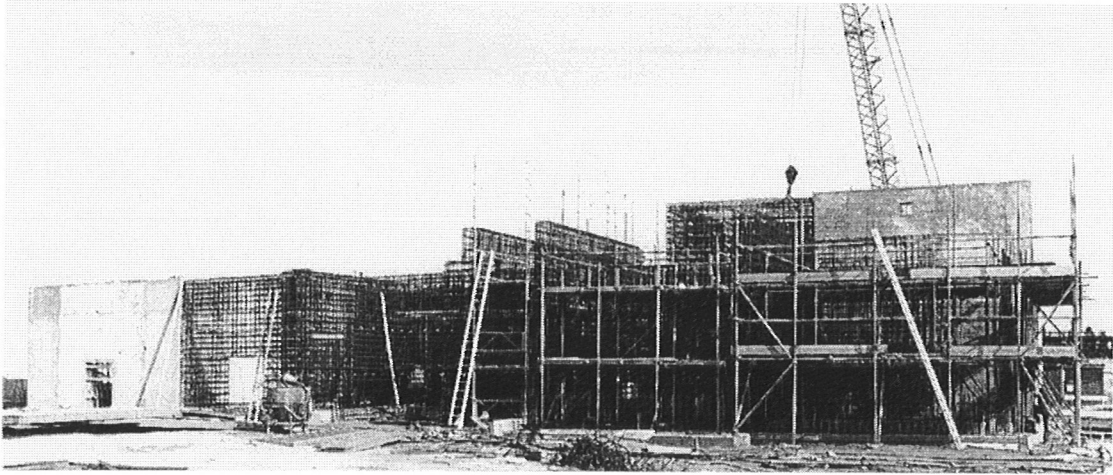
Explosives processing building (previous figure) during construction. Steel reinforcement bars are visible in the walls before cement pouring.
